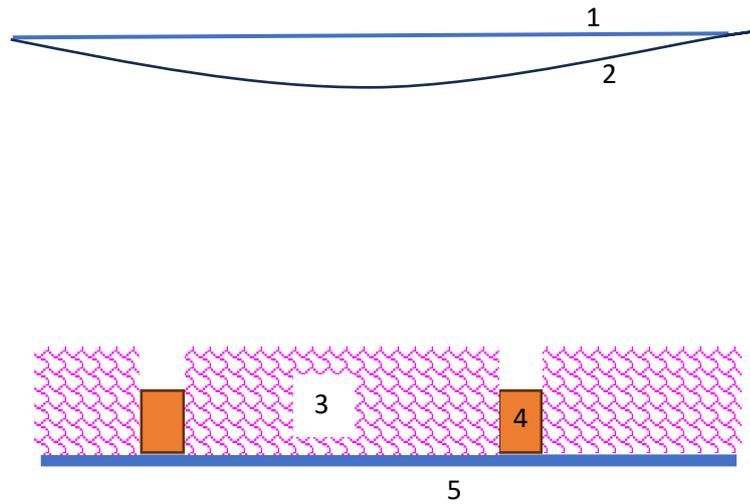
Ceiling insulation schematic – batts between joists. Key: 1. Metal roof. 2. Reflective sarking. 3. Fibreglass insulation 4. Ceiling joists. 5. 12mm plasterboard
